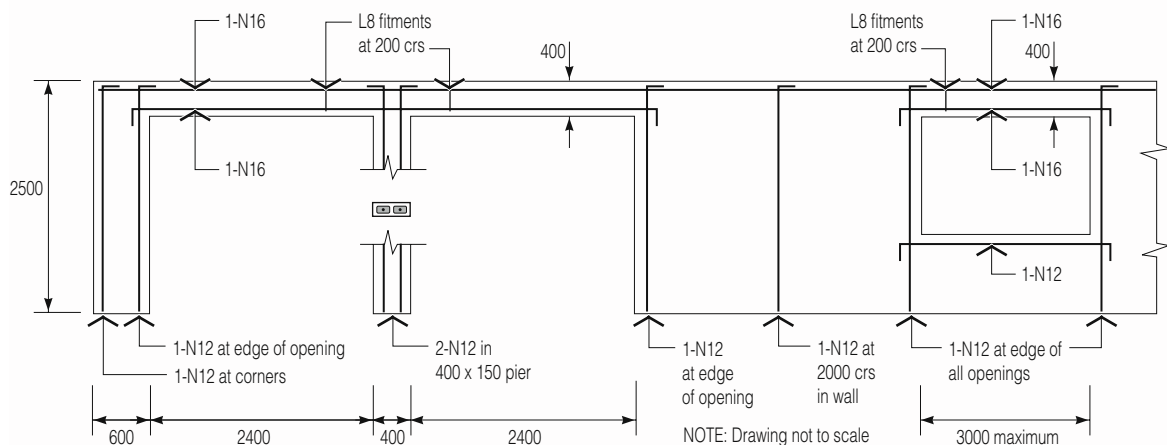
Wall Reinforcement for 140-mm Leaf for Wind Classifications N1, N2 and N3 and 2500-mm Wall Height
